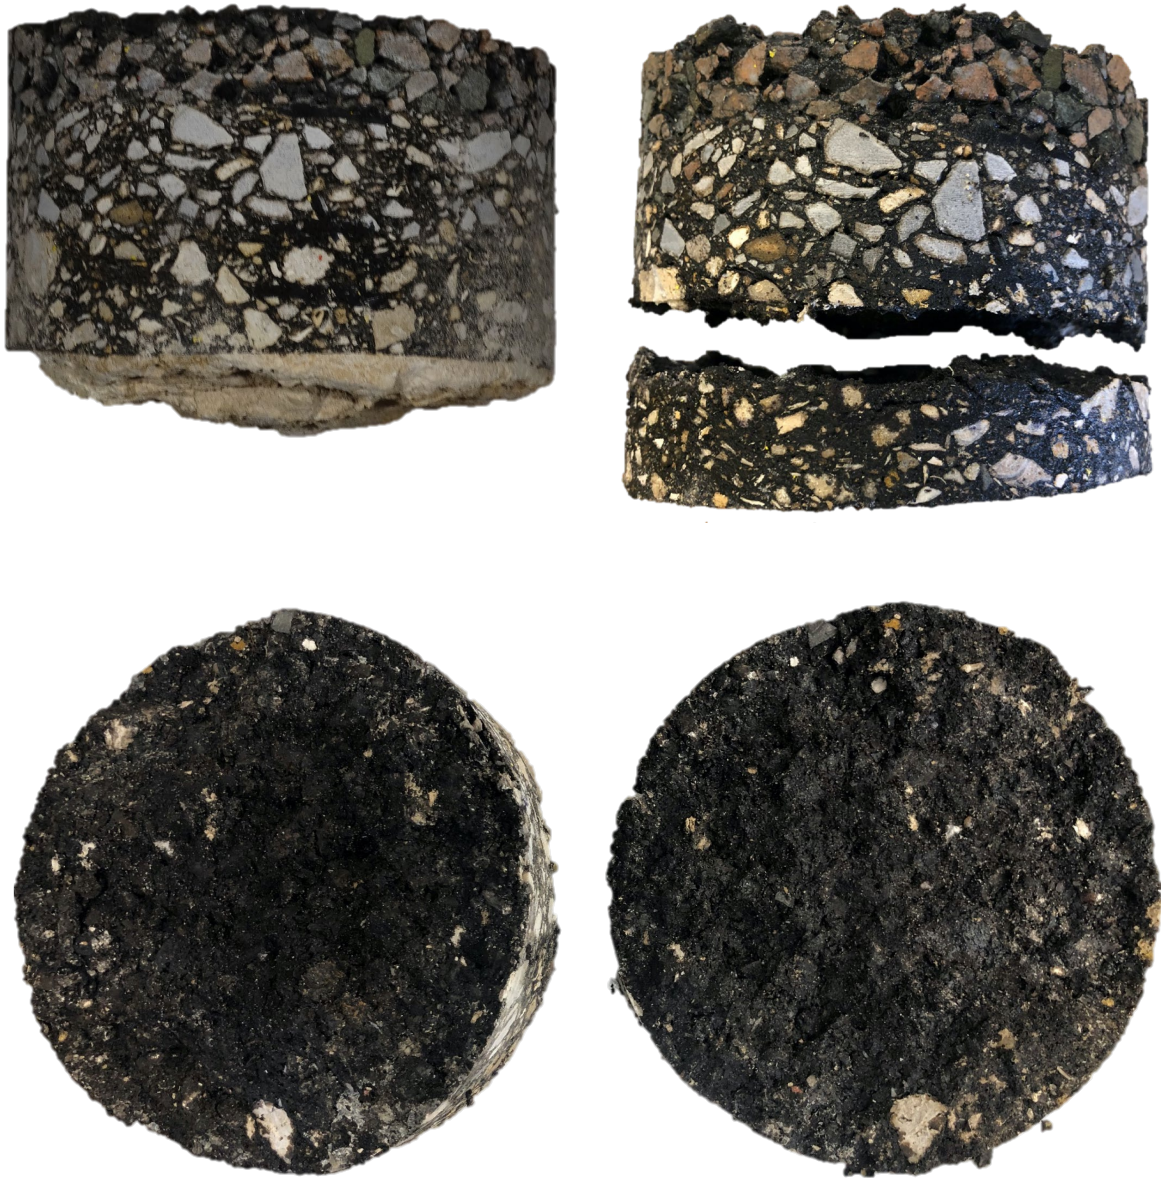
US 17 Control Section MP 17.401 Bond Test Failure Outside of Interface
